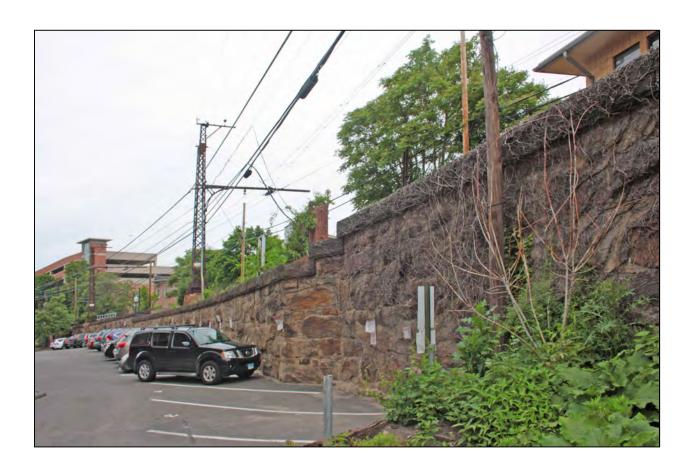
Ann Street Bridge west side, south abutment, camera facing southeast.
